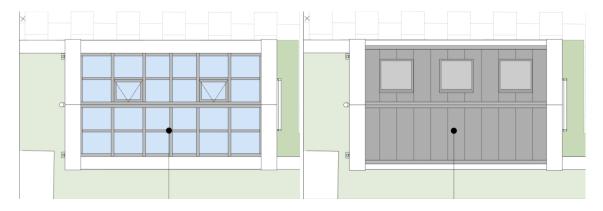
Approved roof plan (left) and proposed roof plan (right)
